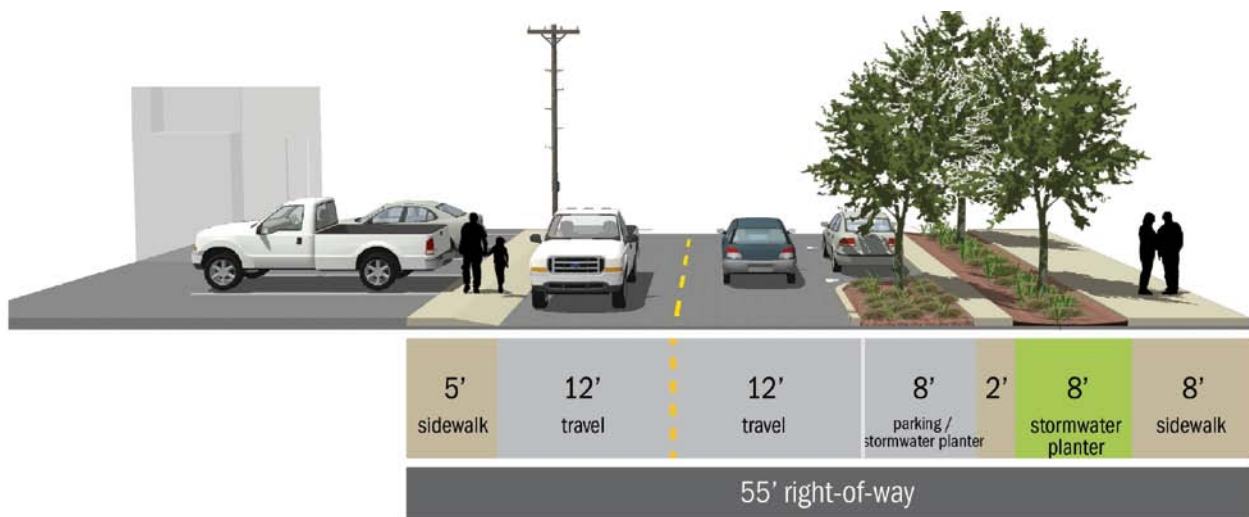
Conceptual Cross-Section for Stubb Street with continuous access (looking east)
